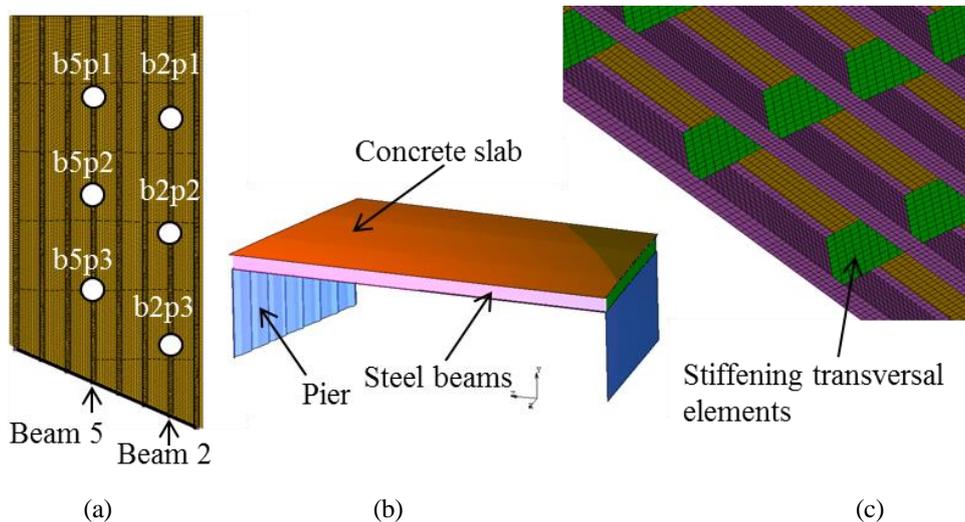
Span 2 of US202/NJ23 overpass, 3D model and FE mesh. (a) Top view of the concrete slab with sensor locations (b=beam, p=point), (b) side view of the 3D model. Mesh details of the steel beams with stiffening transversal elements under the concrete slab (c)
